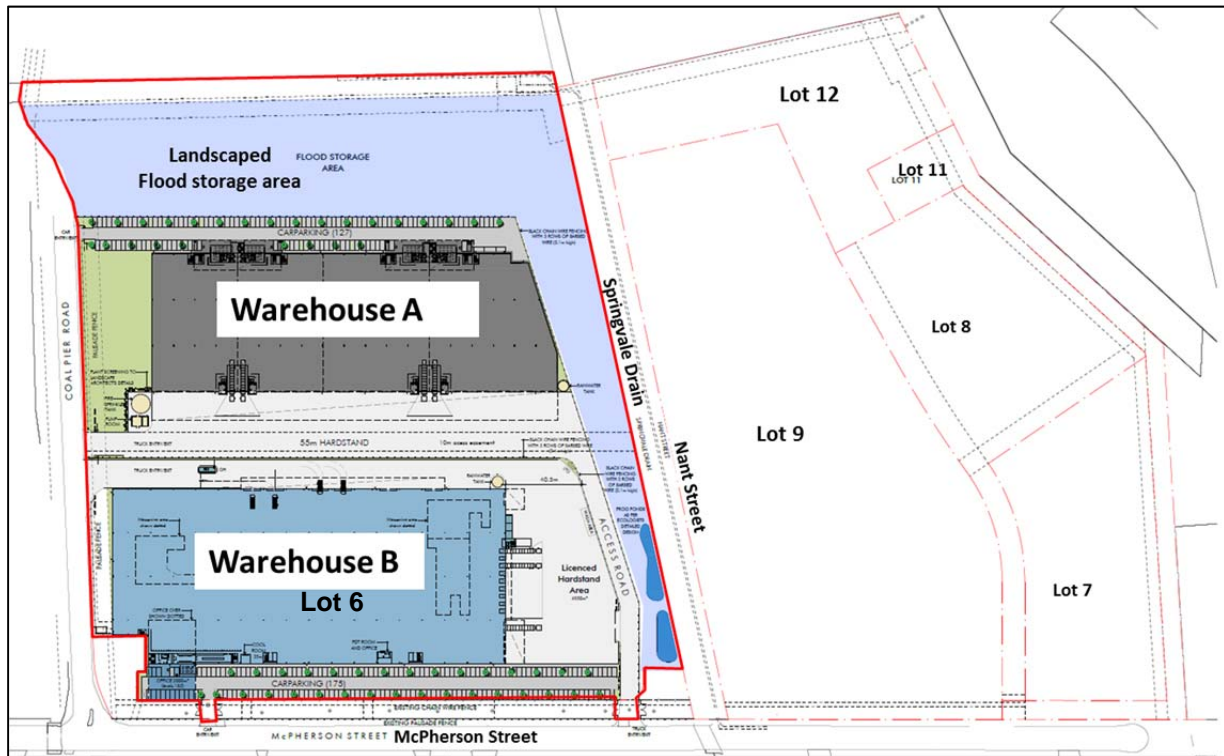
Approved site layout (subject Lot 6 outlined in red)
